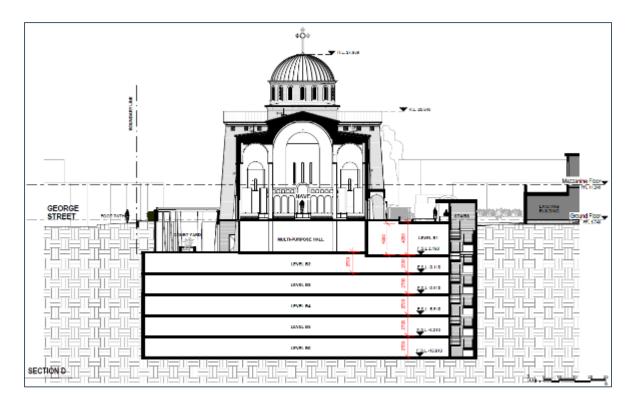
Extract of sectional drawing when viewed from the western elevation (short section).
